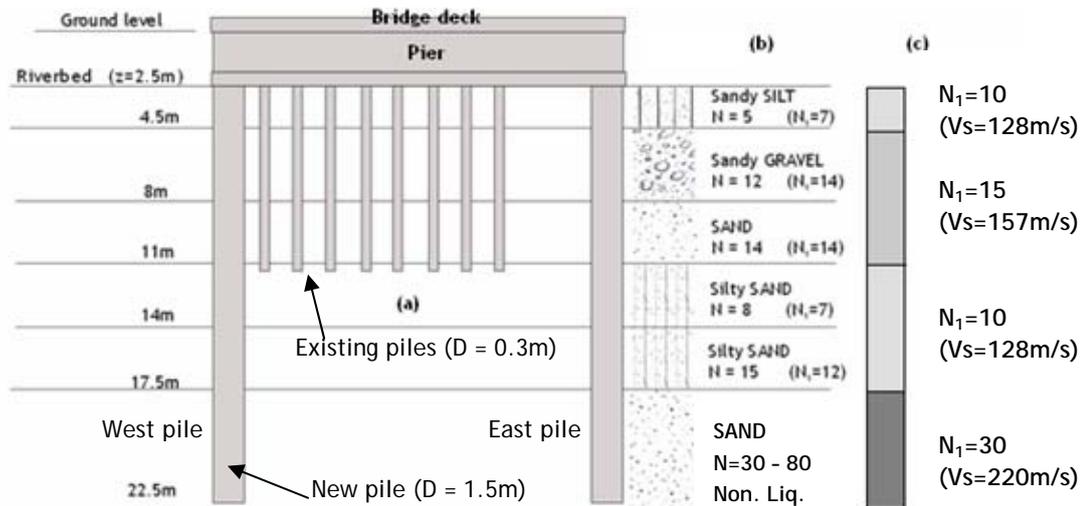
Central pier of bridge: (a) Foundation layout, (b) adopted soil profile, (c) soil properties used in analysis
